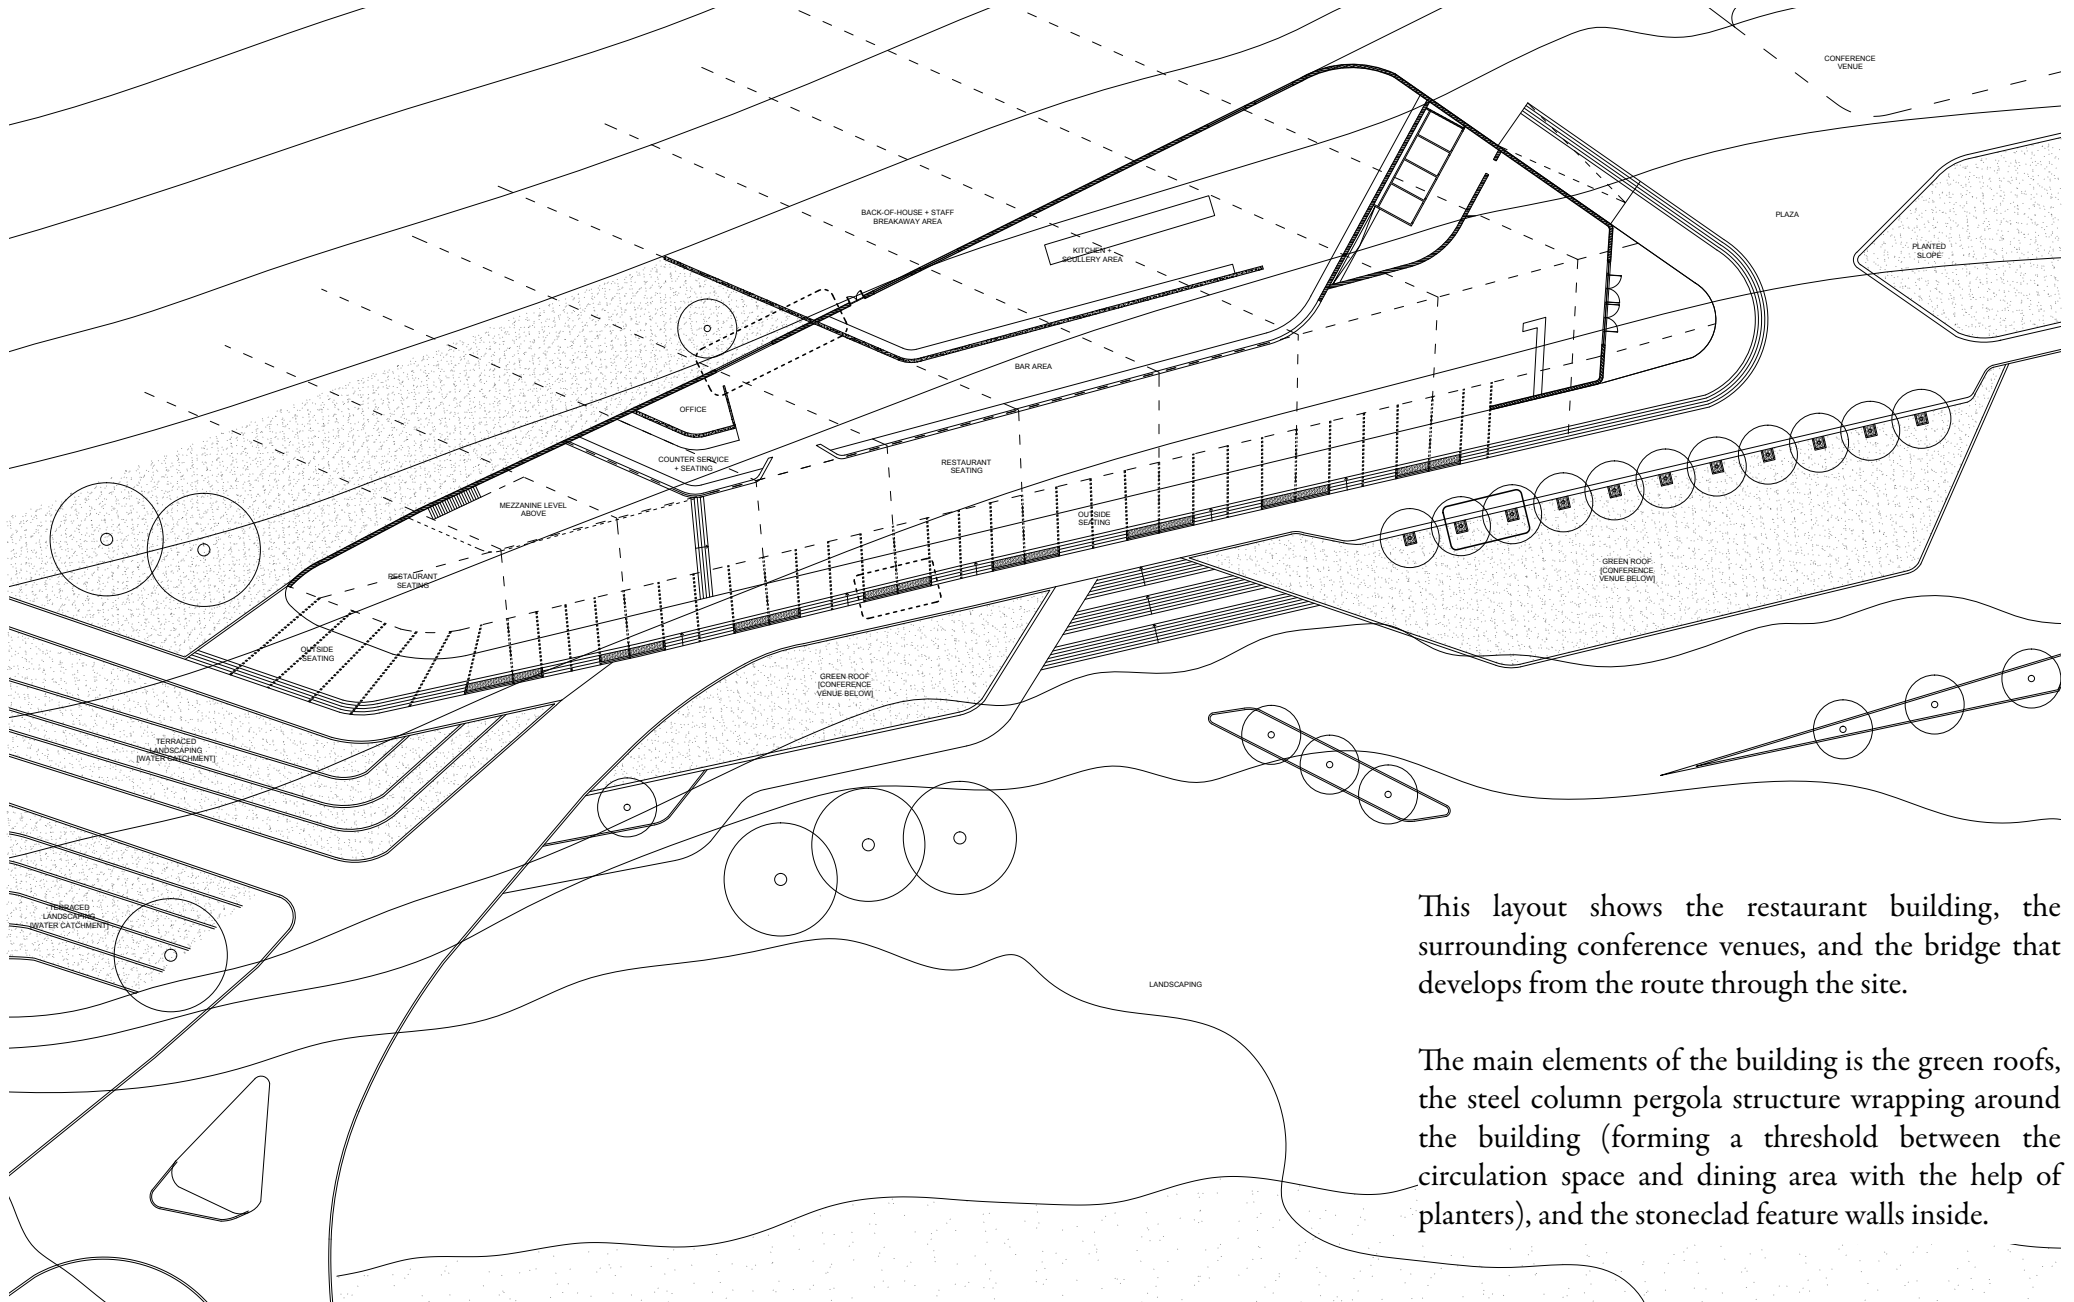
Roof plan: restaurant + conference facilities (Author, 2020)
